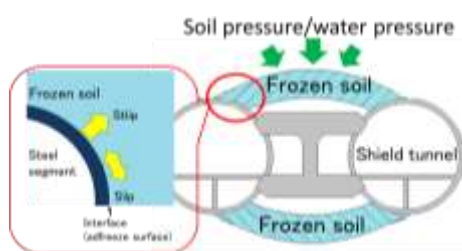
Typical underground widening work using frozen soil (conceptual image)
